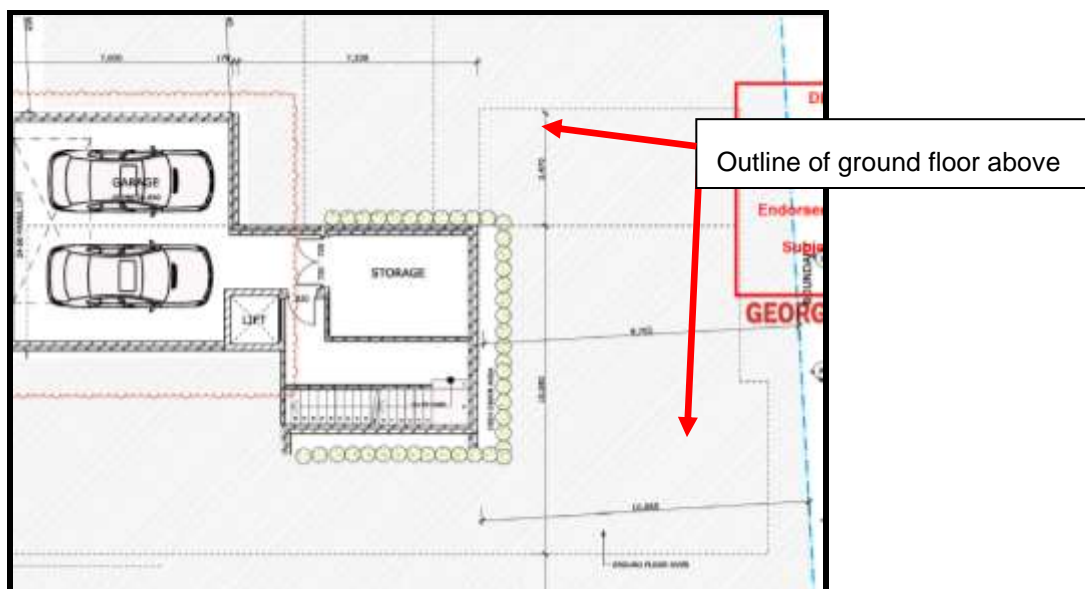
Approved Basement Plan showing outline of the ground floor above (Source: Council file)
